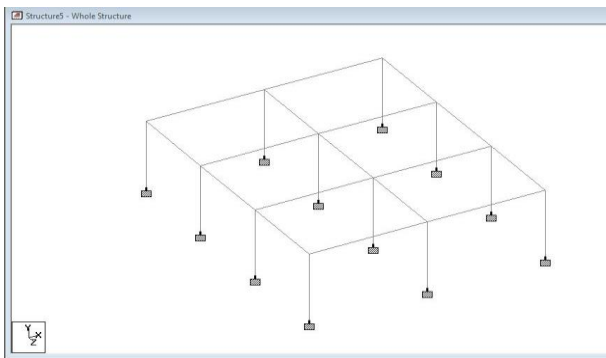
CASE-V OF PARTIAL CONSTRUCTION FRAME [Building constructed up to first floor]
